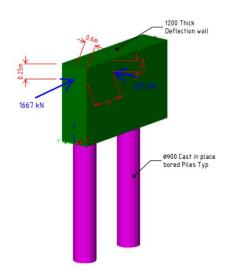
Typical PLR deflection wall geometry and loading for light rail
